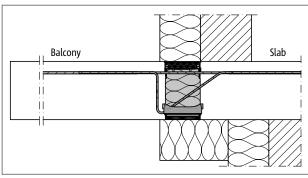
Schöck Isokorb® XT type K: Connection for indirectlypositioned floor and TICS
